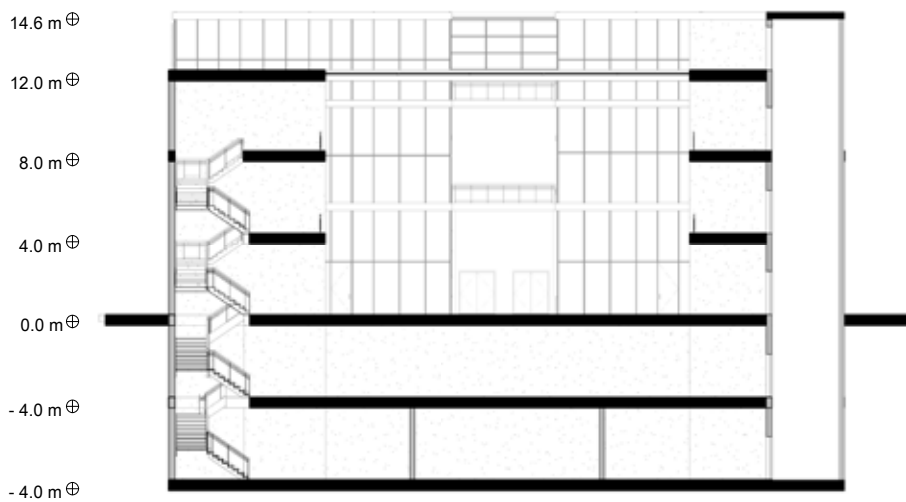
LAKSHMI BUILDING - SECTION B - Scale 1:500.
